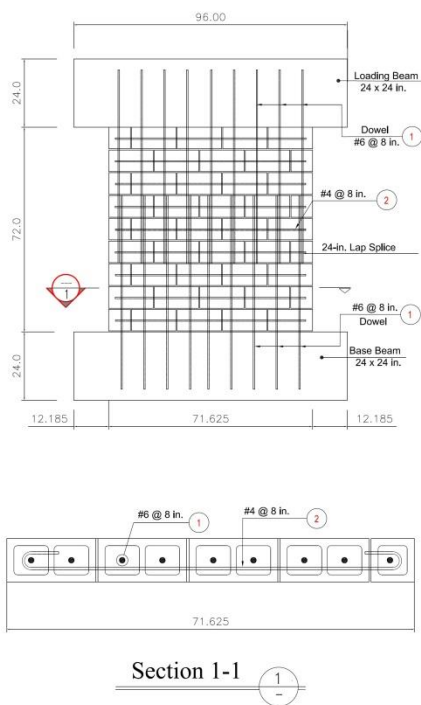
Reinforced masonry wall UT-PBS-01 tested by Ahmadi (2012)
